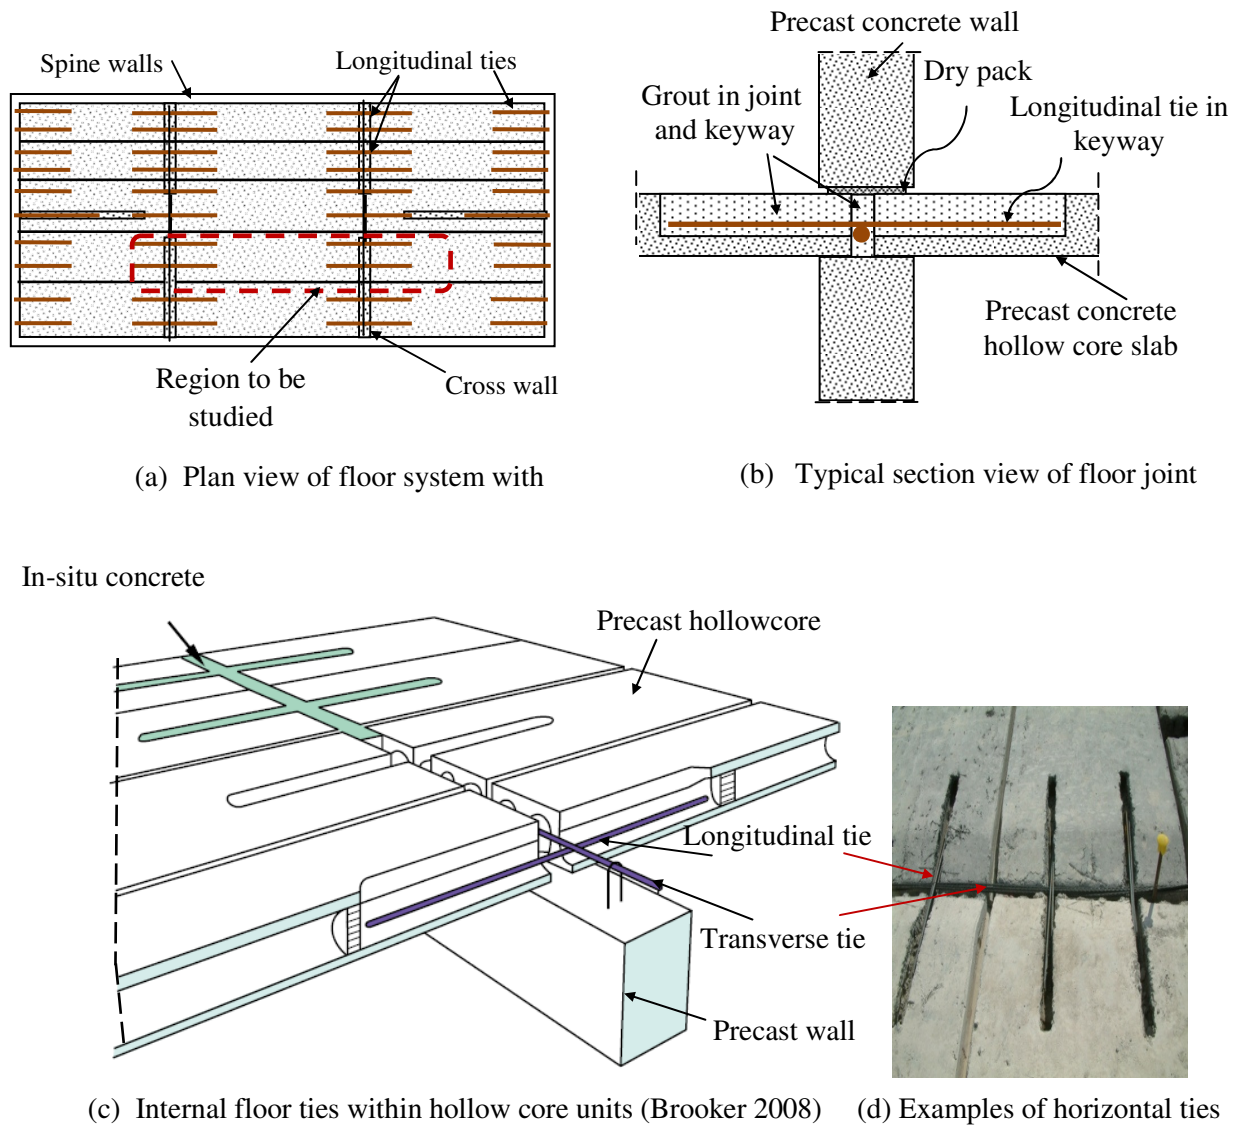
Precast floor-to-floor systems of a cross-wall building
